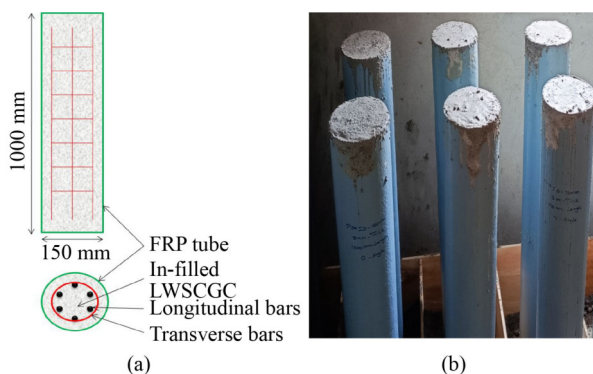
LWSCGC in-filled GFRP tubular columns: (a) typical sectional view of LWSCGC-GFRP composite columns; (b) *in situ* LWSCGC-GFRP composite columns.
